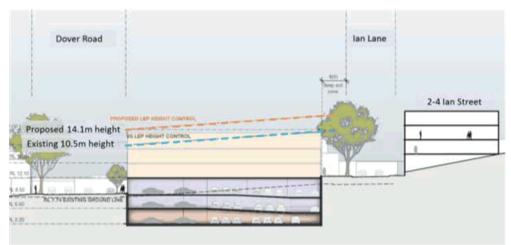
Section between Dover Road and Ian Lane showing the existing and proposed maximum building heights, concept for the site and surrounding existing buildings
